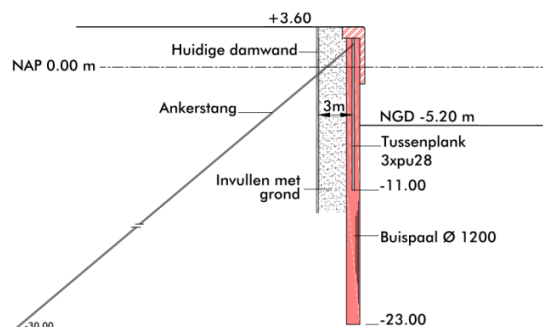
Cross section of the new Sleepbootkade (Post et al., 2021)
